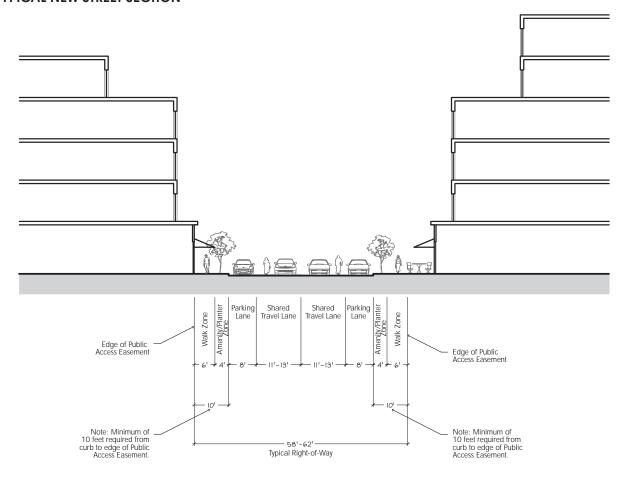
Typical Main Internal Street Section (G-G)
